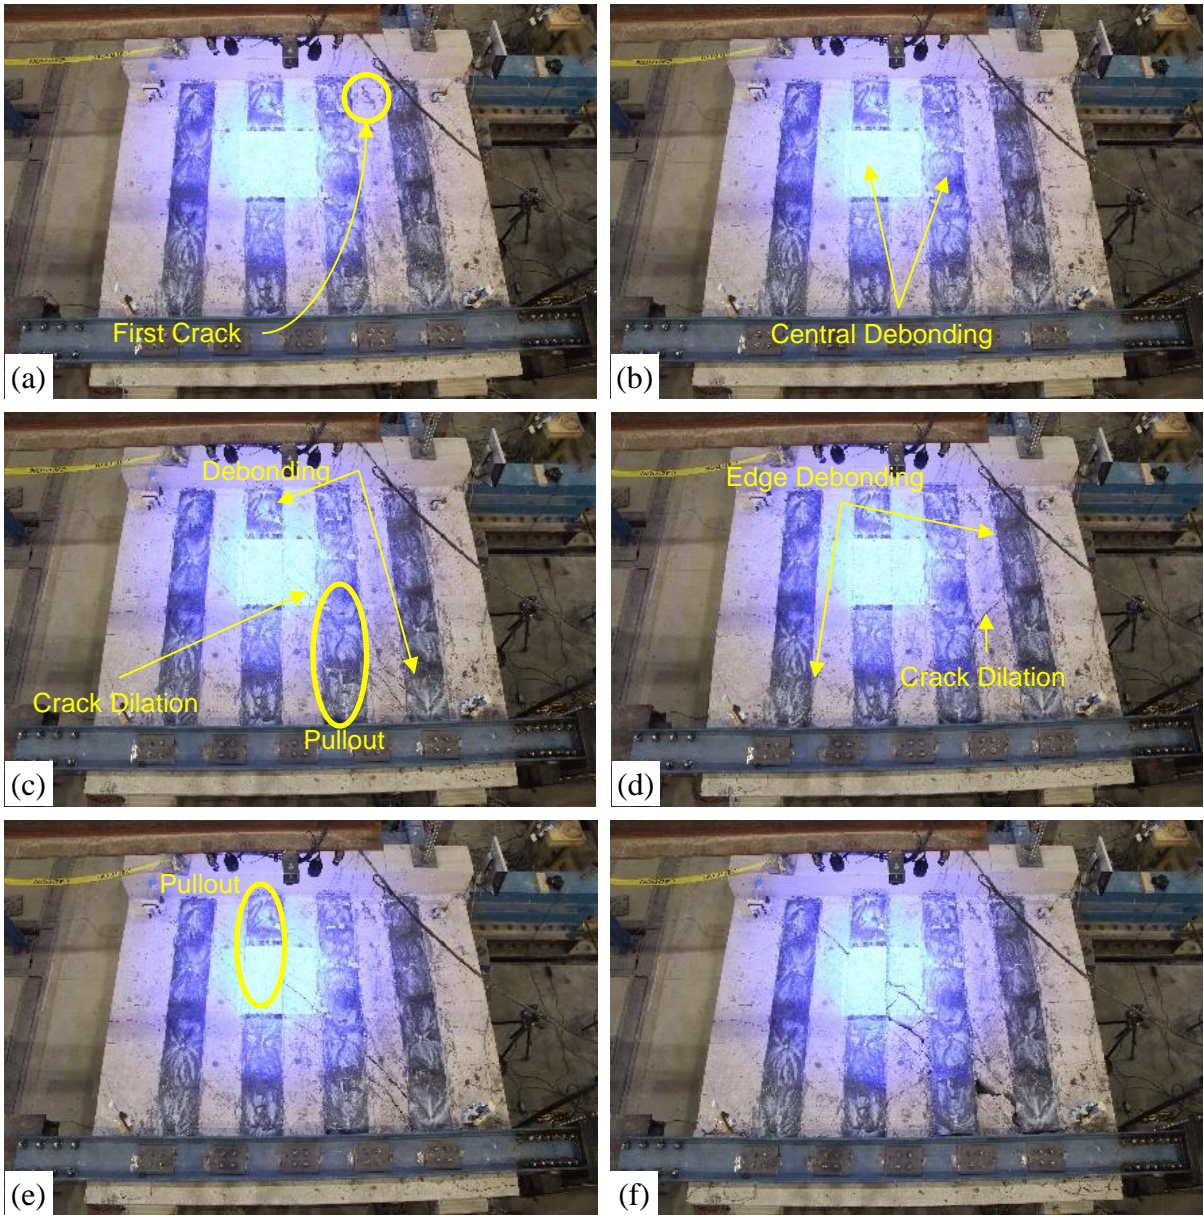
Failure Progression of Specimen CD6: (a) First Crack at 84 kips; (b) Debonding of Sheets S2 and S3 at 250 kips; (c) Crack Dilation at 242 kips; (d) Mirrored Crack Dilation at -214 kips; (e) Pullout of Sheet 3 Anchors at 138 kips; (f) Final Condition of Failed Specimen at 71 kips.
